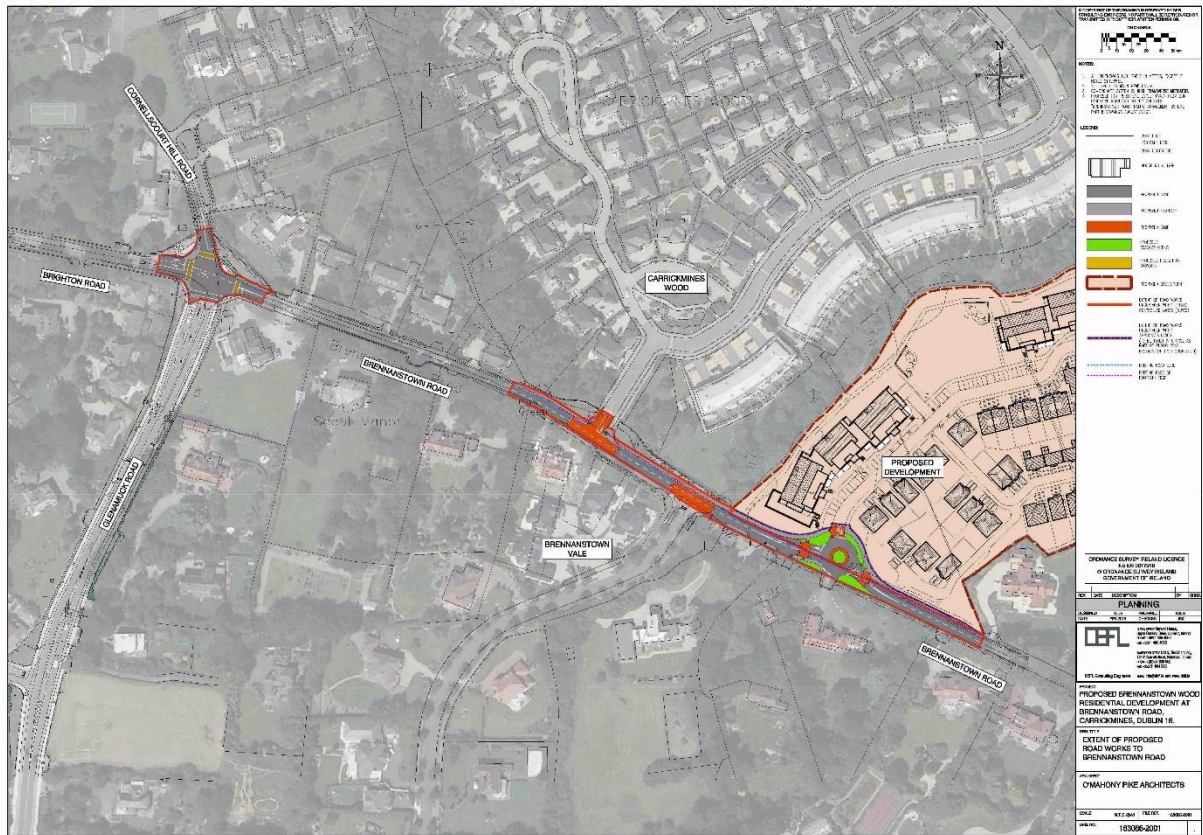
Brennanstown Road – Upgrade works completed as part of the Brennanstown Wood Development
